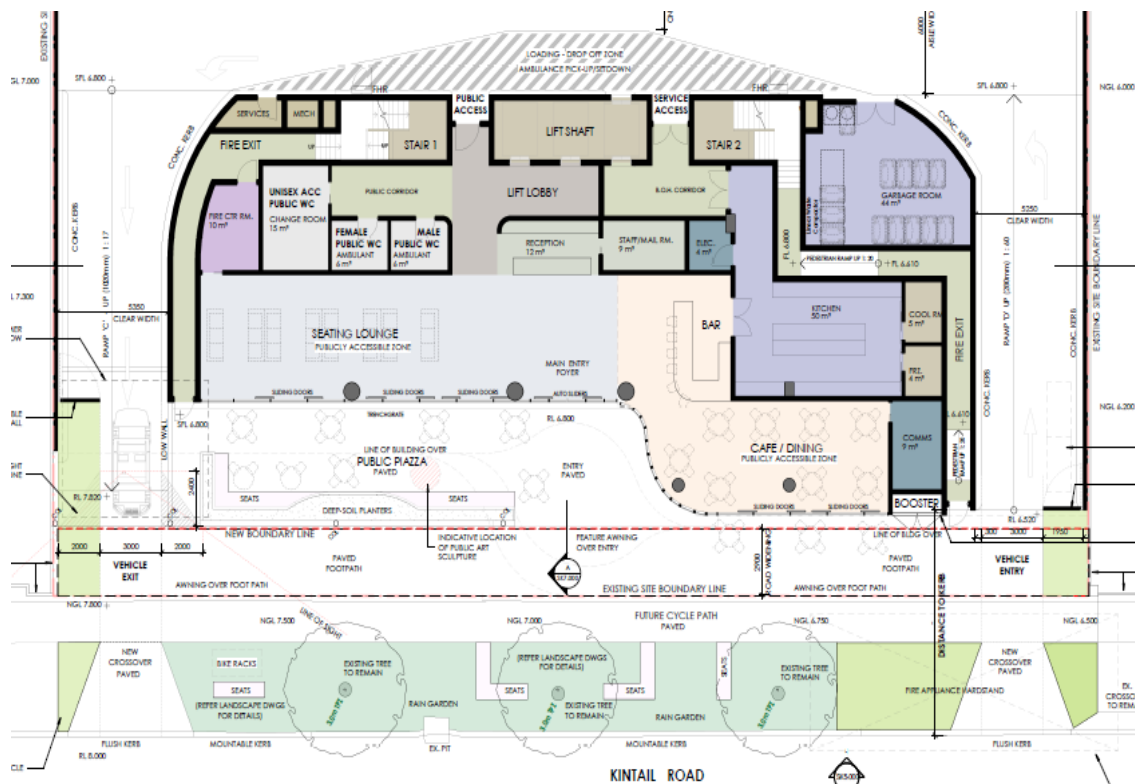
Current ground floor plan showing revised verge layout with additional verge seating, additional entry points into the café and forecourt area, opening up of the forecourt to users of the footpath and modified vehicle entries in and out of the site
